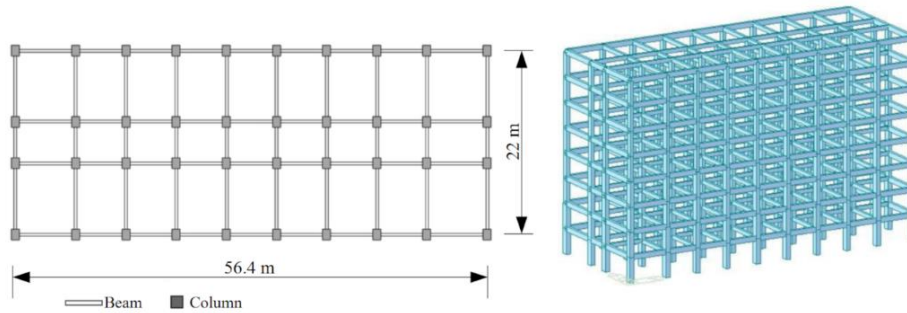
Structural plan and isometric view of MRF-F and MRF-I buildings
